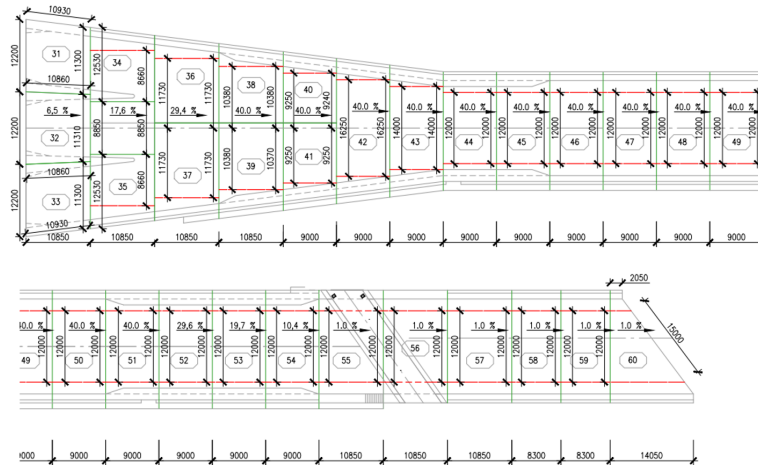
Floorplan of the chute with marked expansion (green lines) and work joints (red lines) [5].
